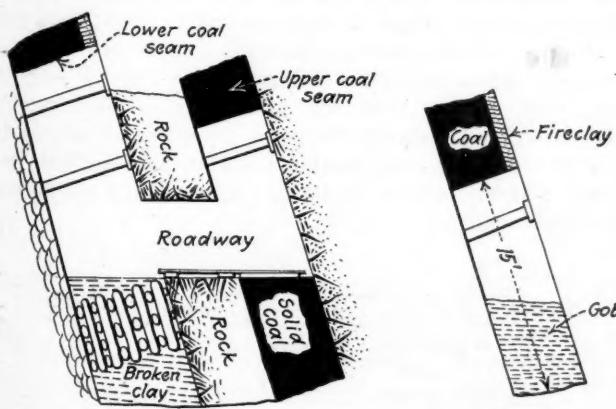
AND 11—SEAM SECTION AND WORKING PLAN
